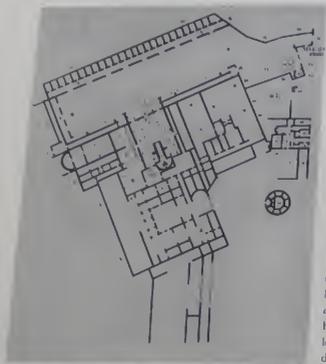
S. Stefano in Via Latina. Architectural. Foundation walls of villa, etc.
